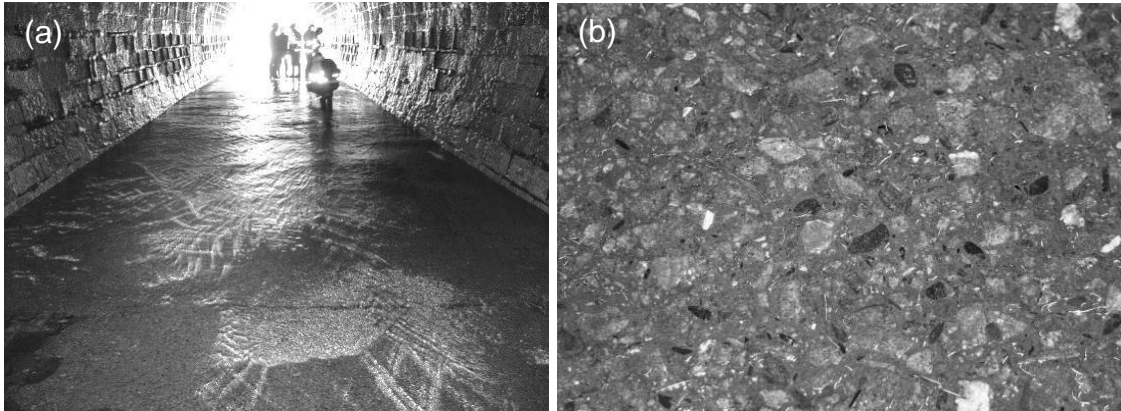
Abrasion of the high-performance concrete test field after one operating period. (a) Straight tunnel section, (b) detail (about 20 to 30 cm)
